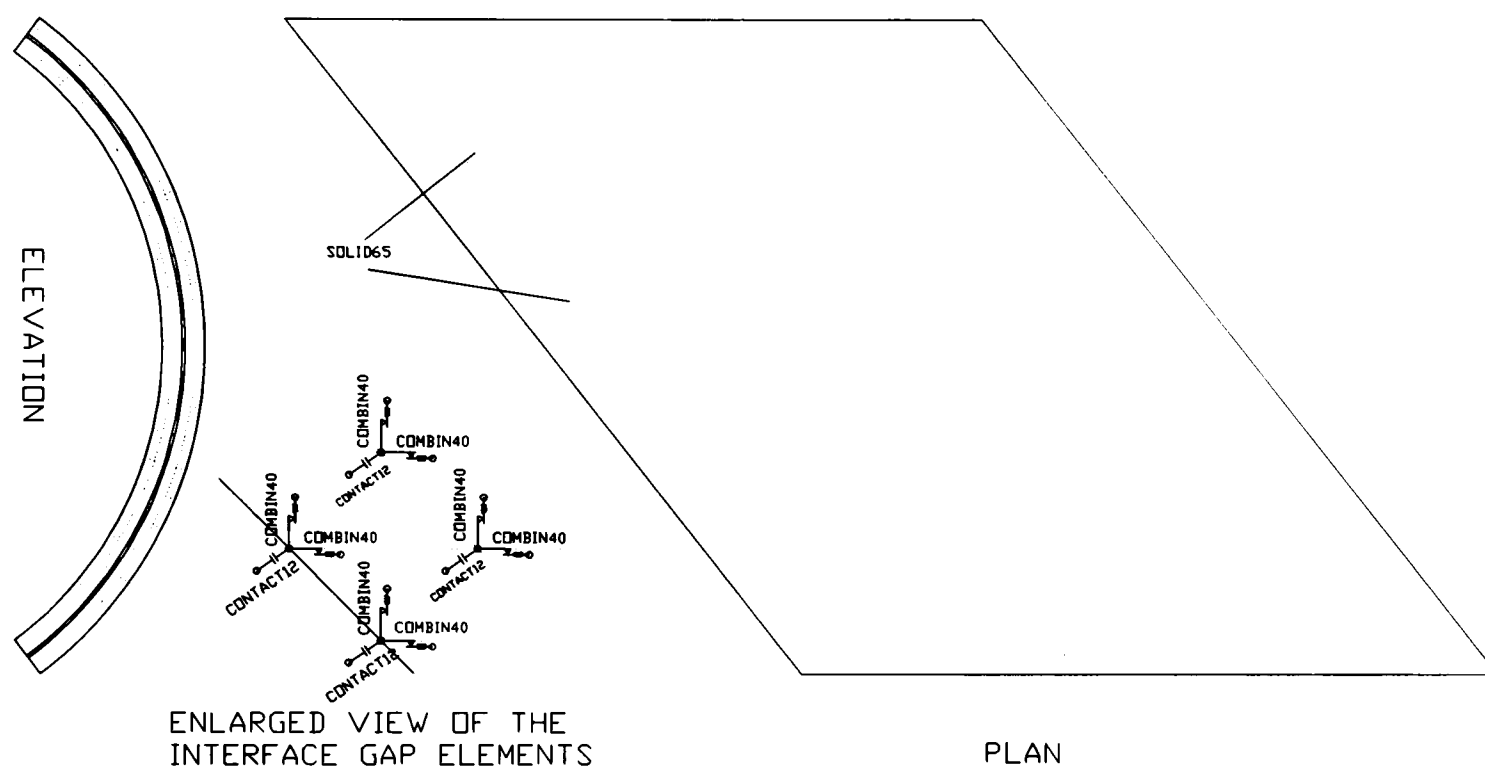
Finite element model of multi-ring brickwork skewed arch bridge 3-4
